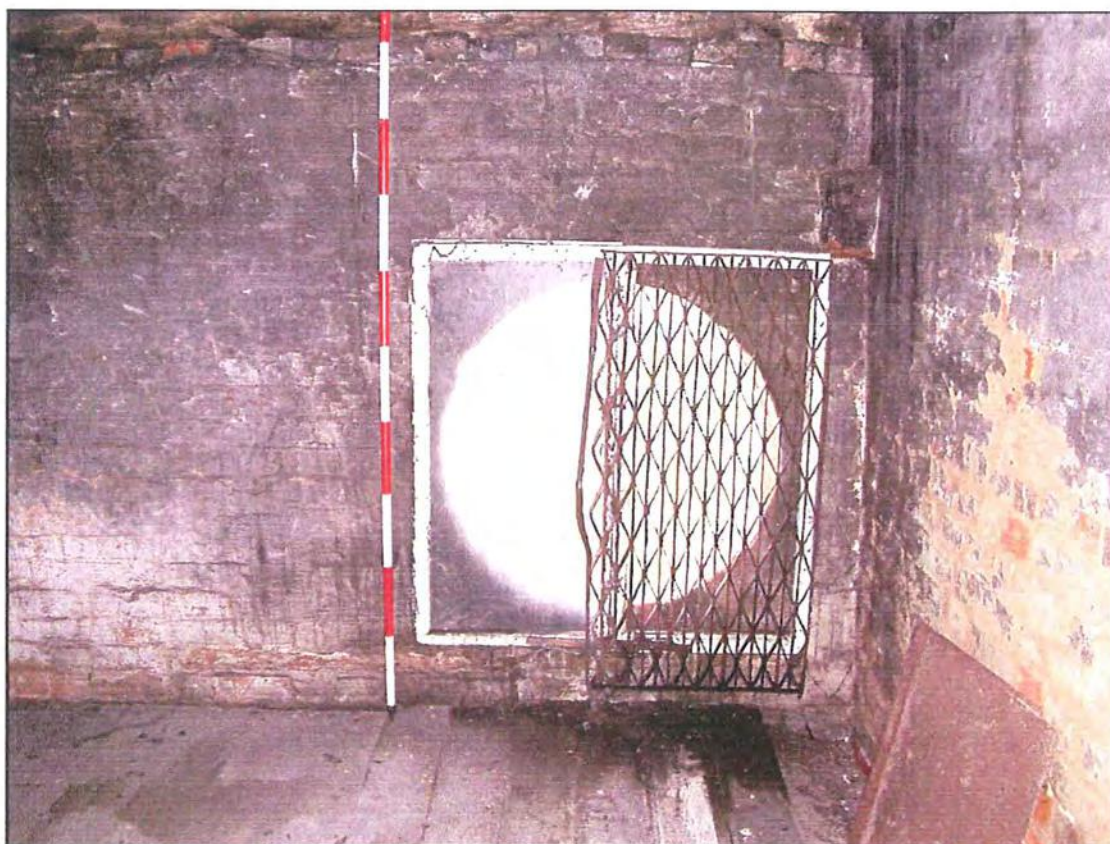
West section, east half first floor showing remains of ladder from the ground floor
